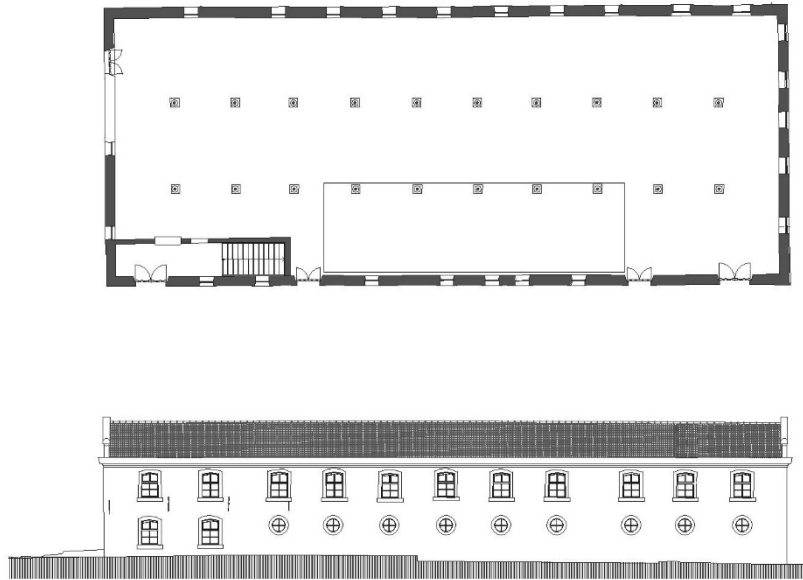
The Plan Layout and the Façade of Mess Hall Building
